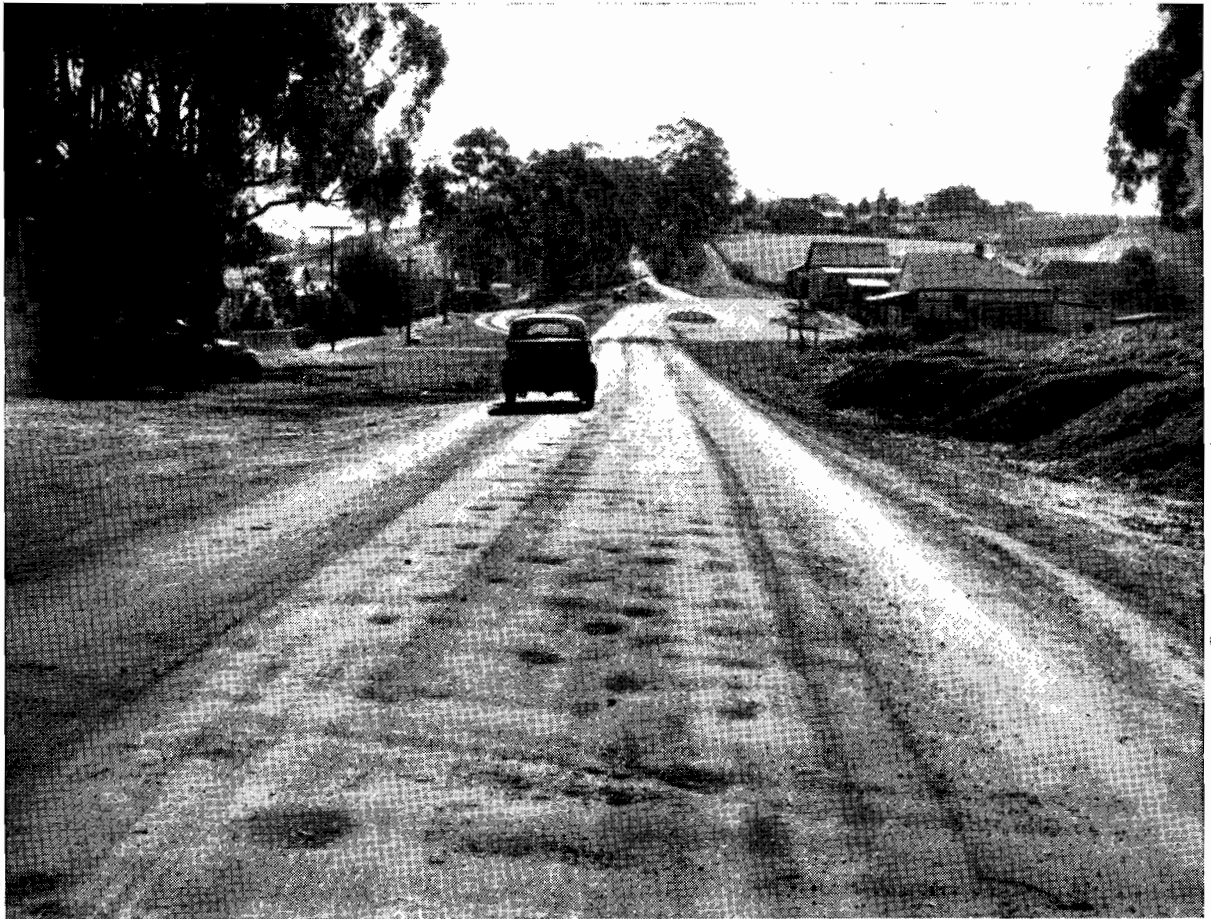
Walhalla Road through Erica Township, before reconstruction.
